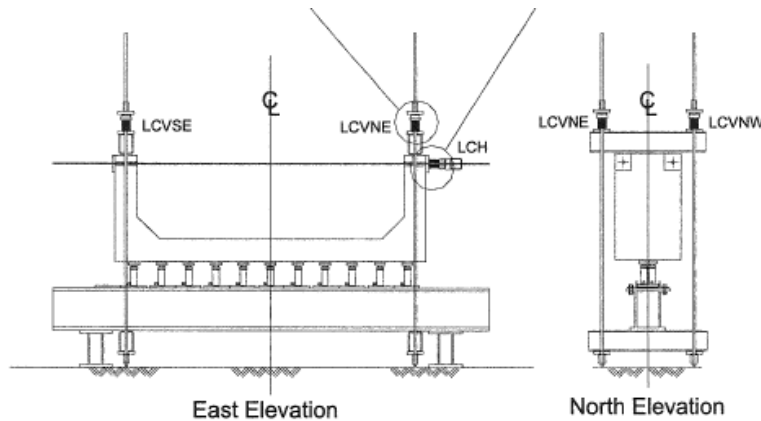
Box culvert test setup for testing one-half of a specimen [14]
